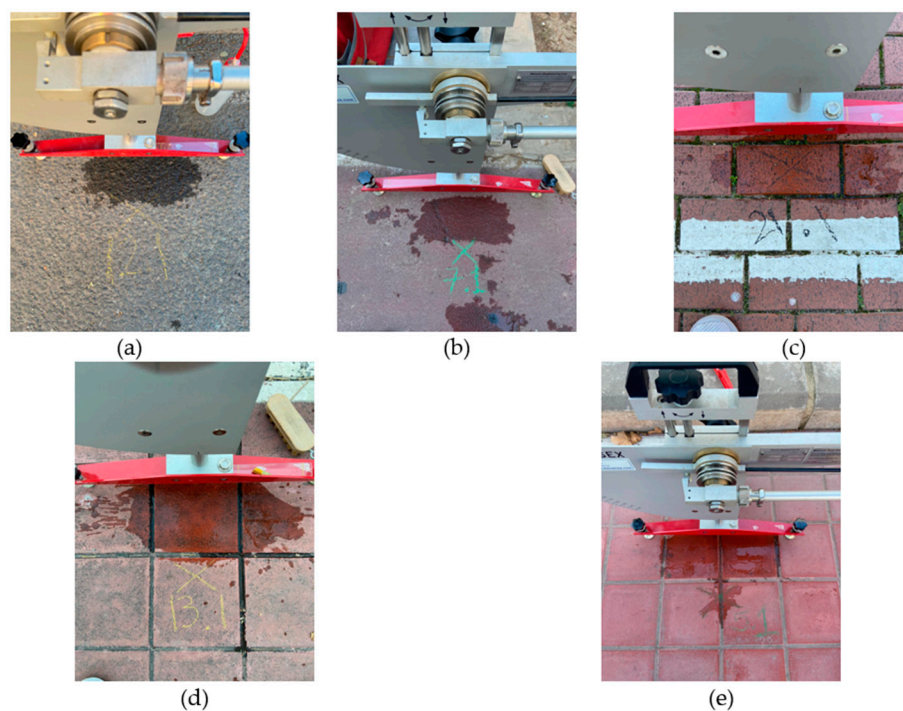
Types of pavements in bike lanes. (a) Asphalt pavement; (b) concrete pavement; (c) painted cobble pavement; (d) smooth painted tile pavement; and (e) rough painted tile pavement.
